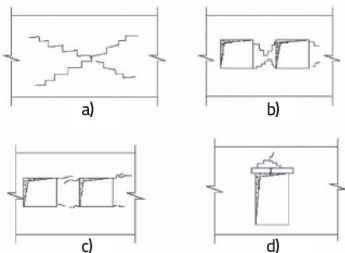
Various types of cracks observed in masonry walls [2]
